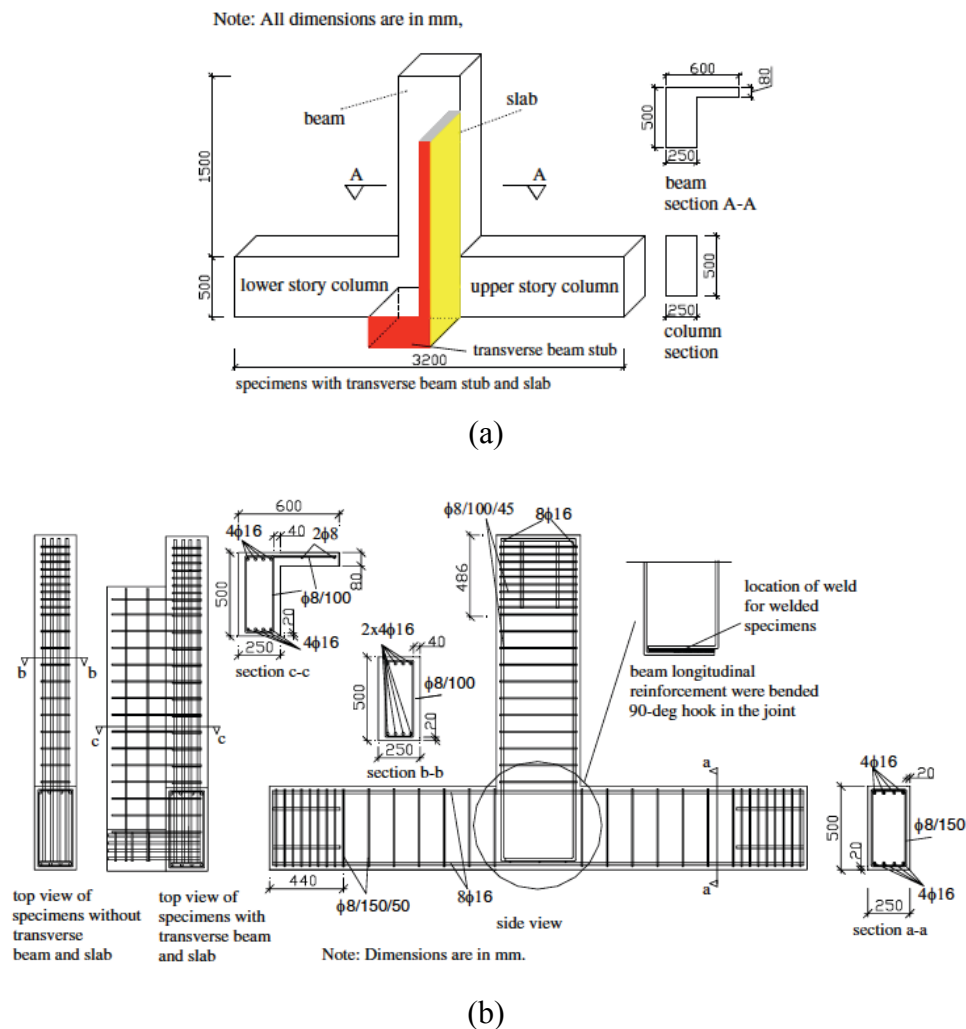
Specimen details (Ilki et al., 2011): (a) Geometry of specimen; (b) Reinforcement details
